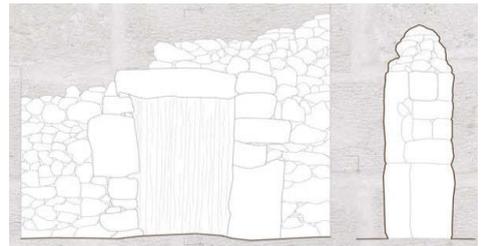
Dry stone wall with boulders and shapeless stones (Source: Caleca, 2018)
